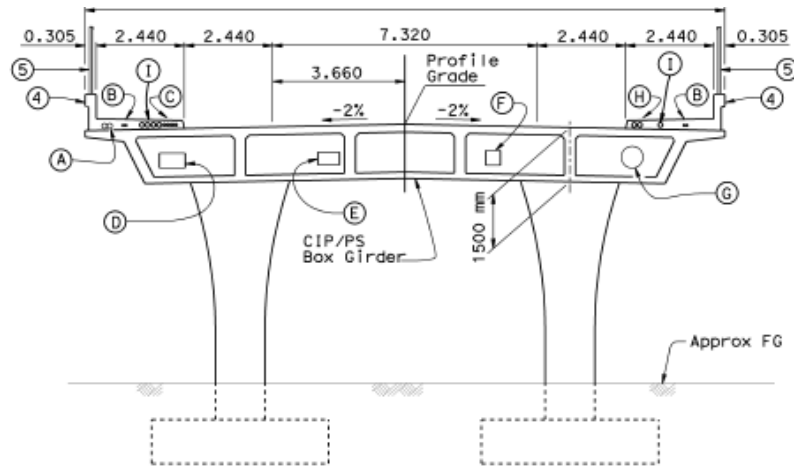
Typical Section of the Willow Avenue Overcrossing Bridge.
